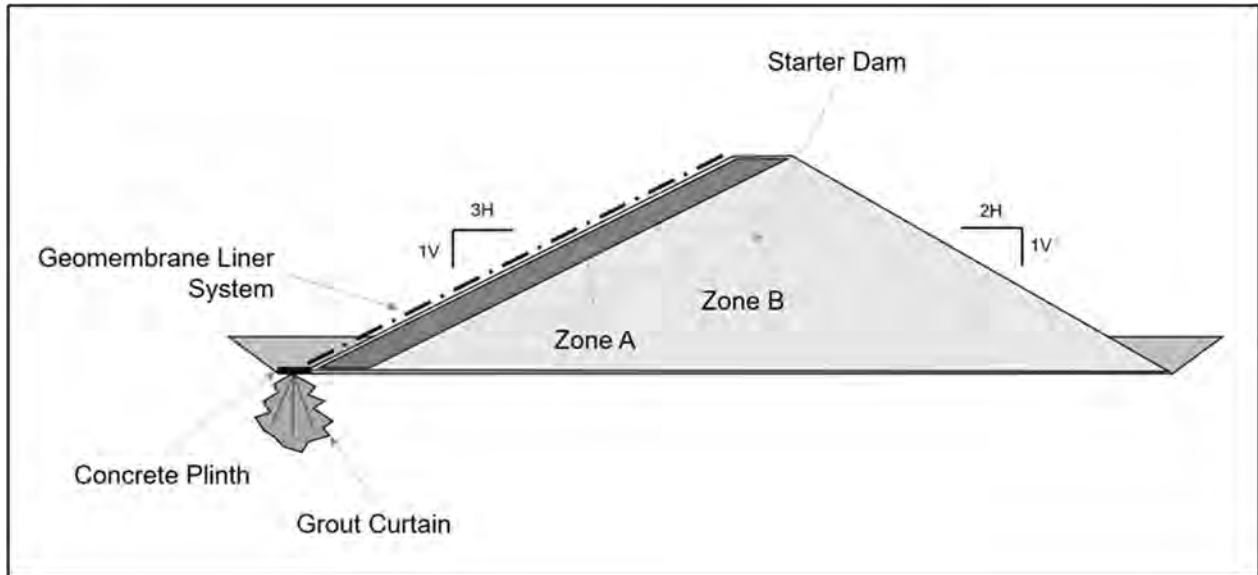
Tailings Management Facility Starter Dam – Conceptual Section (KP, 2021)
